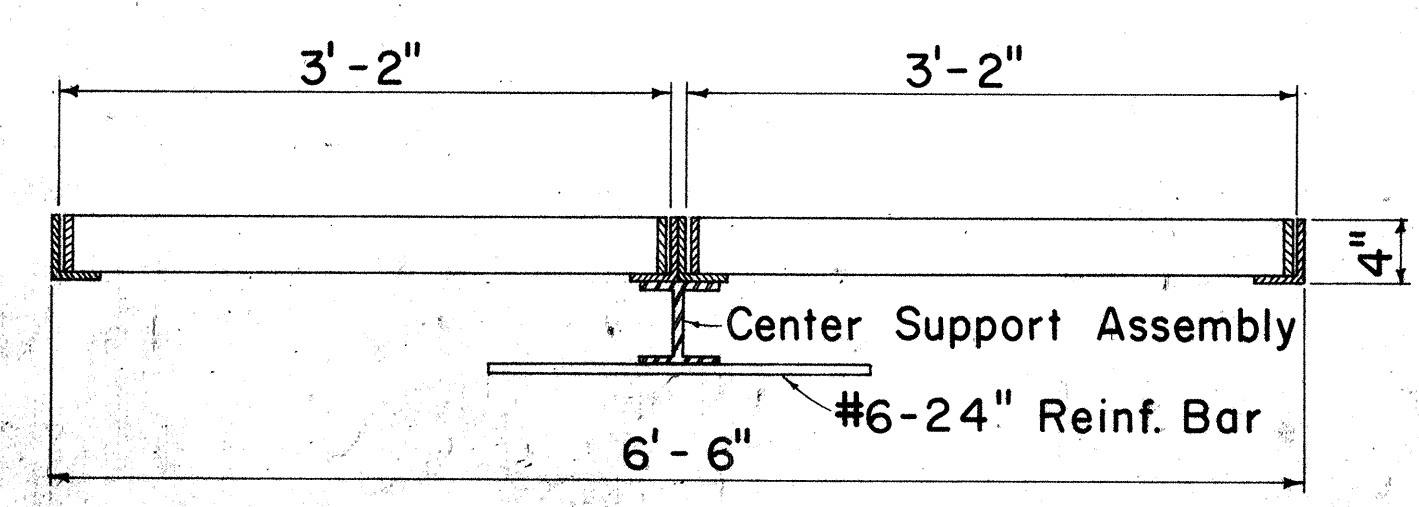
STEEL FRAME AND GRATES
